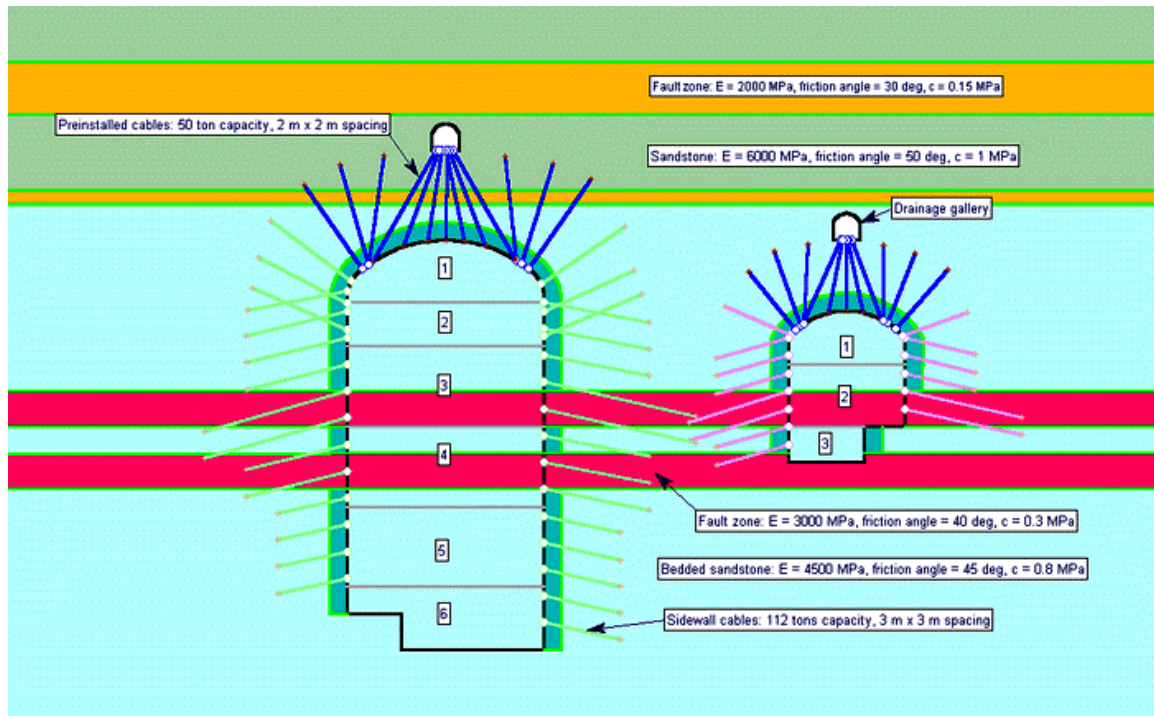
Numerical model showing distribution of material and layout of reinforcement in the rock mass surrounding the caverns.
